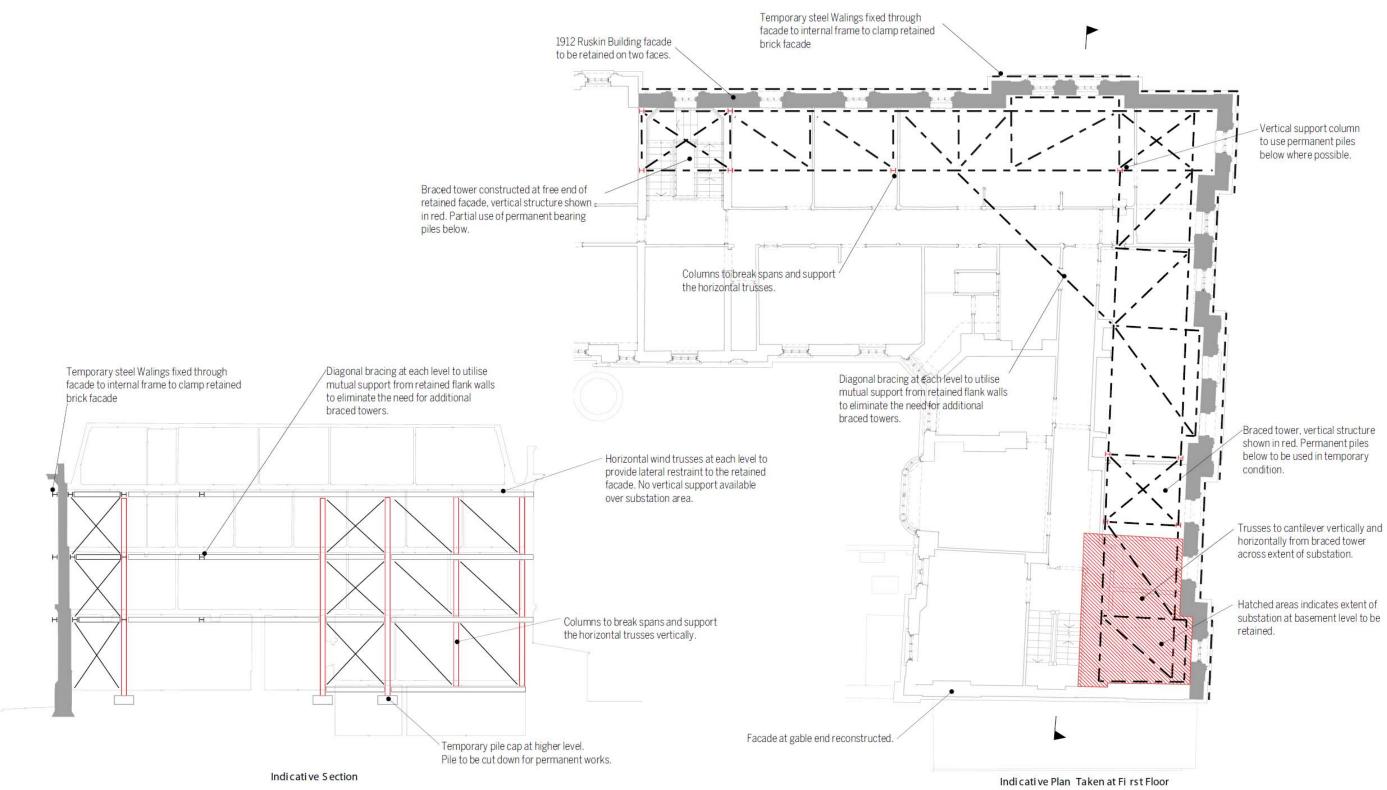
Building Reconstruction – Indicative Temporary Works Scheme
